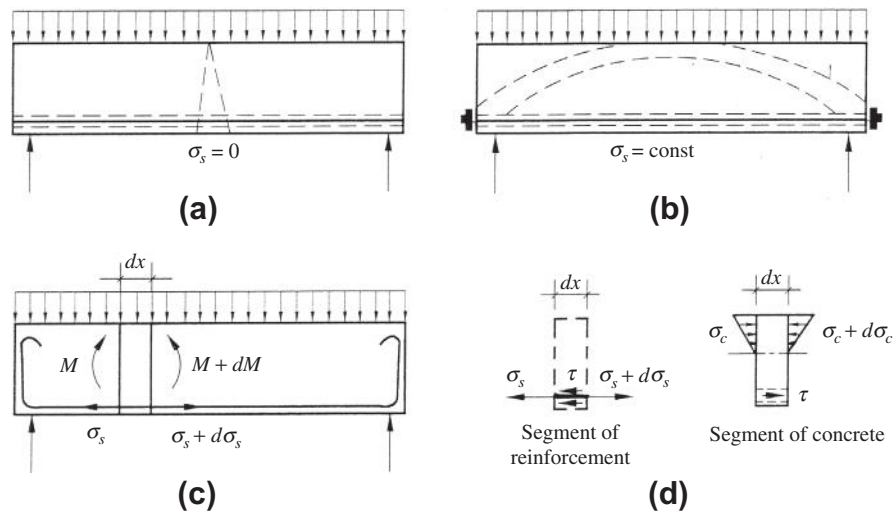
Adhesion and anchorage of reinforcement in beam: (a) without adhesion and anchorage, (b) anchorages set up at both ends, but without adhesion along reinforcement, (c) reinforcement adhered reliably with adjacent concrete, (d) balance conditions
